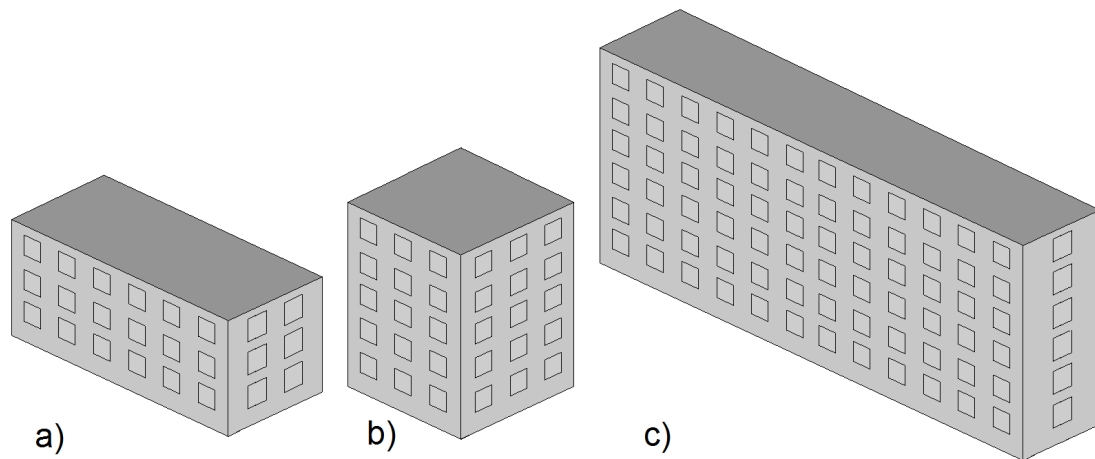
Different common shapes of existing residential building, a) long and narrow lower building, b) square-shaped tower block, c) long and narrow taller building.
